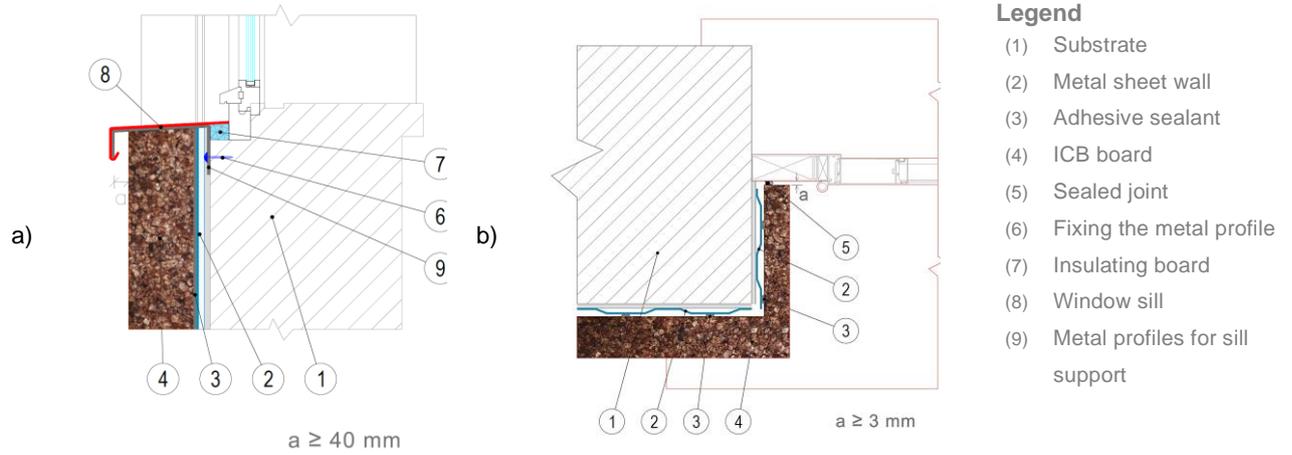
Connection with windows: a) Connection with window sill; b) Connections with side jambs.
